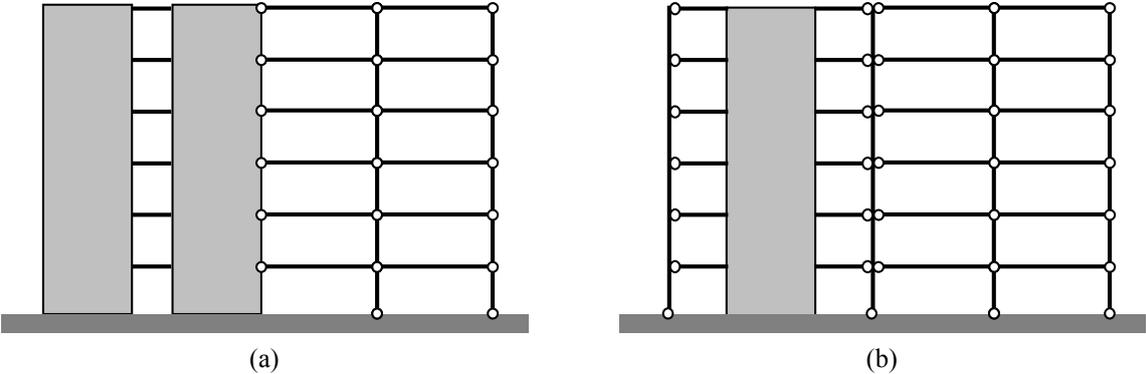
Examples of: (a) conventional hybrid coupled shear wall system, (b) innovative hybrid coupled shear wall system, both connected to a gravity-resisting steel frame with pinned beam-to-column joints.
